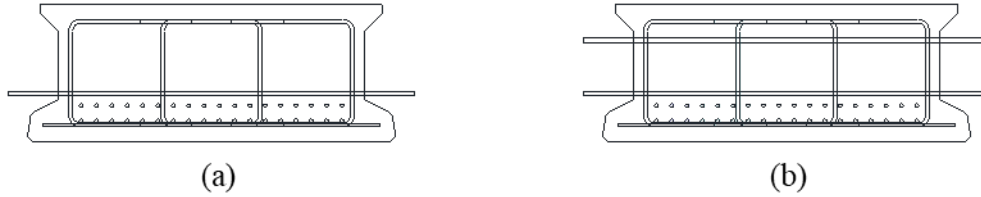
18-inch-deep modified FSB section with (a) one layer and (b) two layers of joint reinforcement
